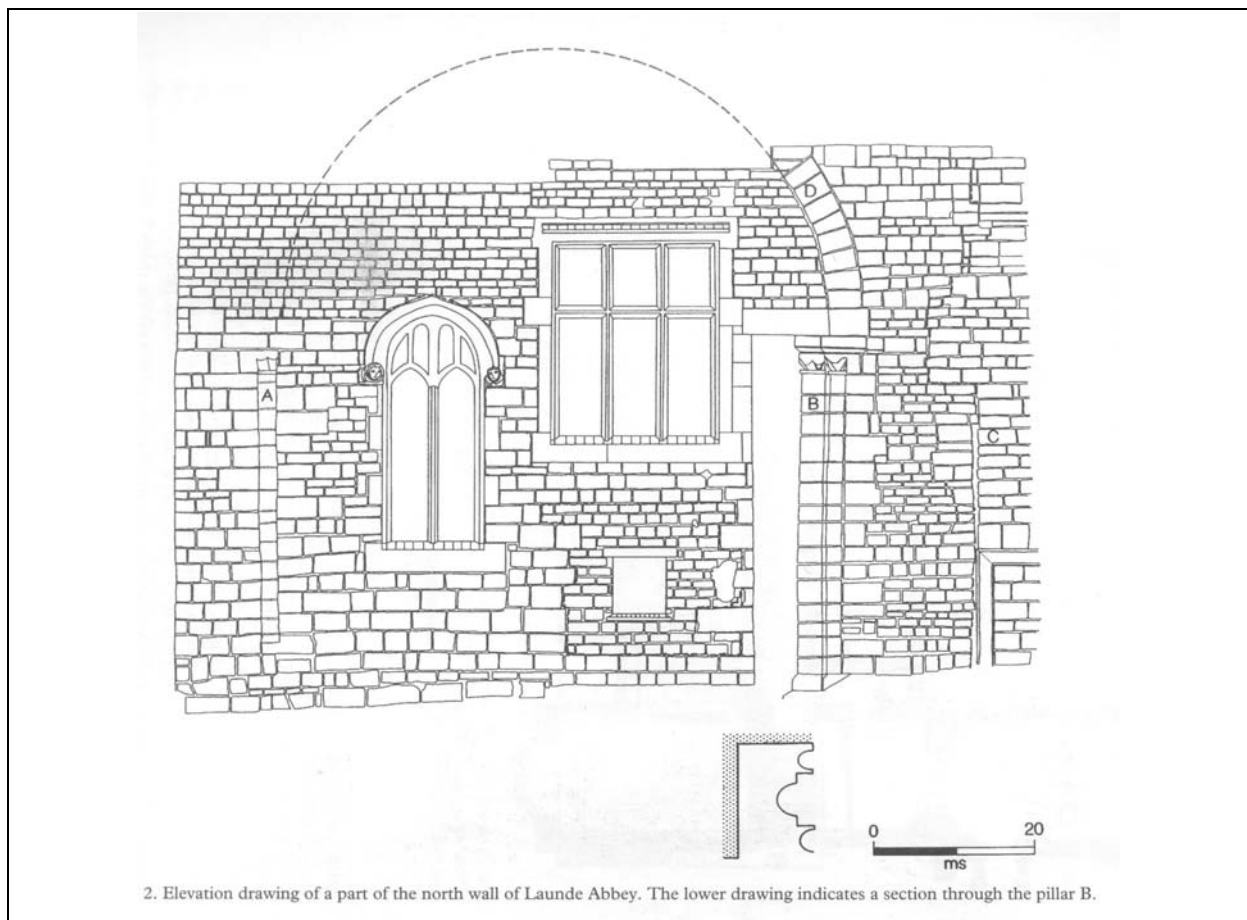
Elevation drawing showing C12 crossing arch embedded in N wall of Launde Abbey (Beavitt 1995).
